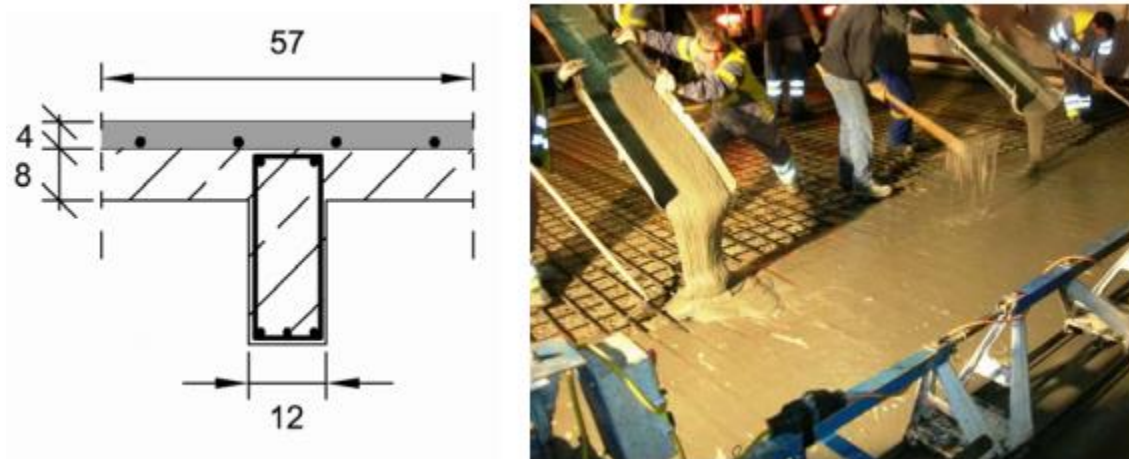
Cross section of floor and the application of R-UHPFRC on an industrial flooring [39].
